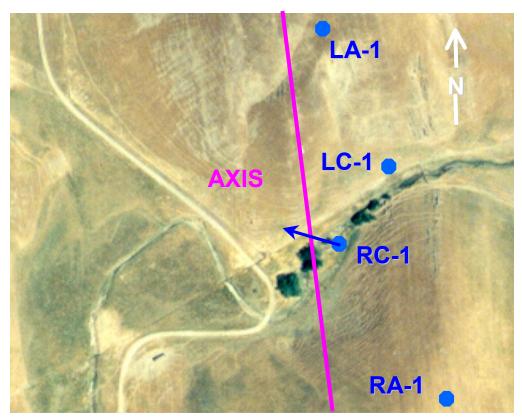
Aerial view of Hunters Dam site (Owens Component) and drill holes
